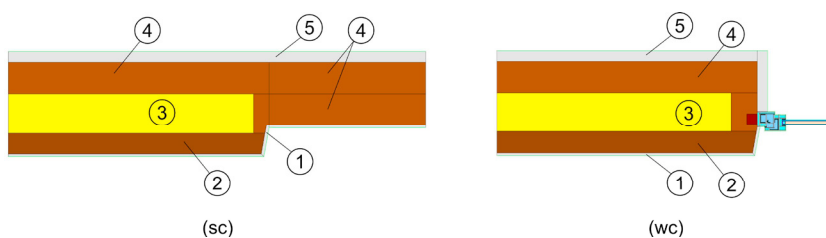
Sub window-current wall thermal bridge (sc) and window-current wall thermal bridge (wc). Numbers are referred to Tables 2 and 3.
